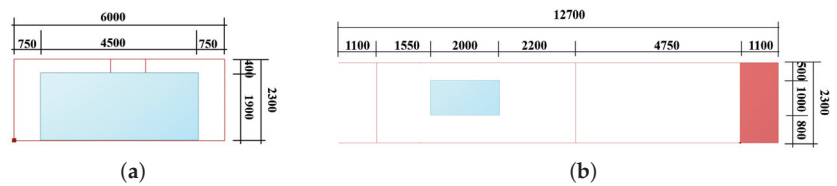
Facade size of one unit. (a) South facade; (b) west facade.
